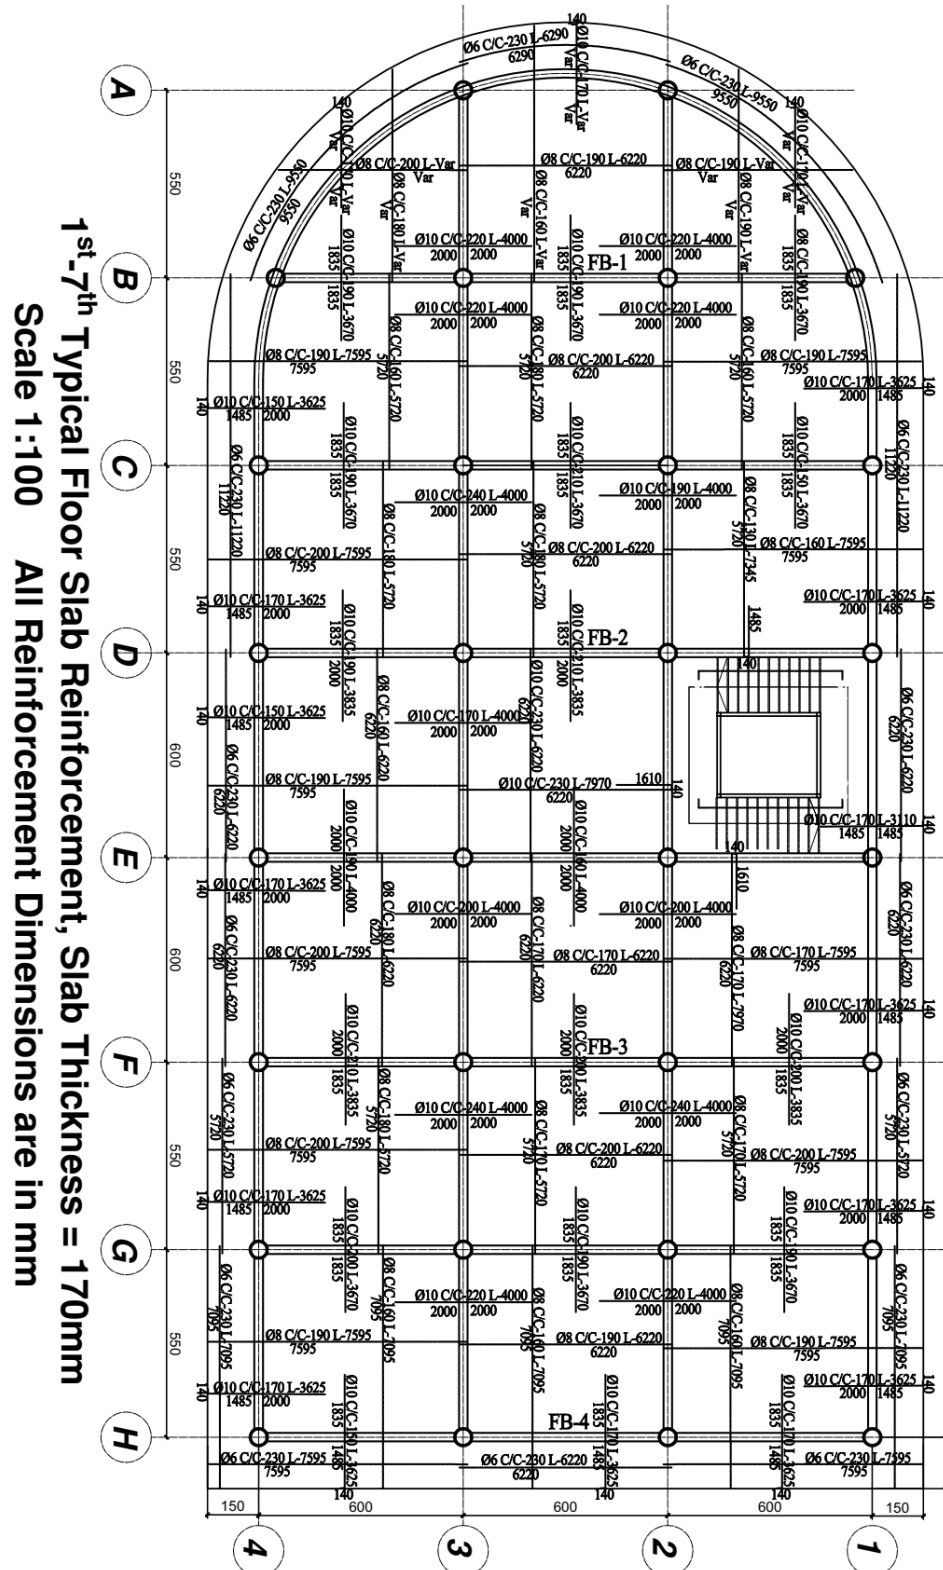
Sample slab detailing for G+7 building with C-25 concrete
